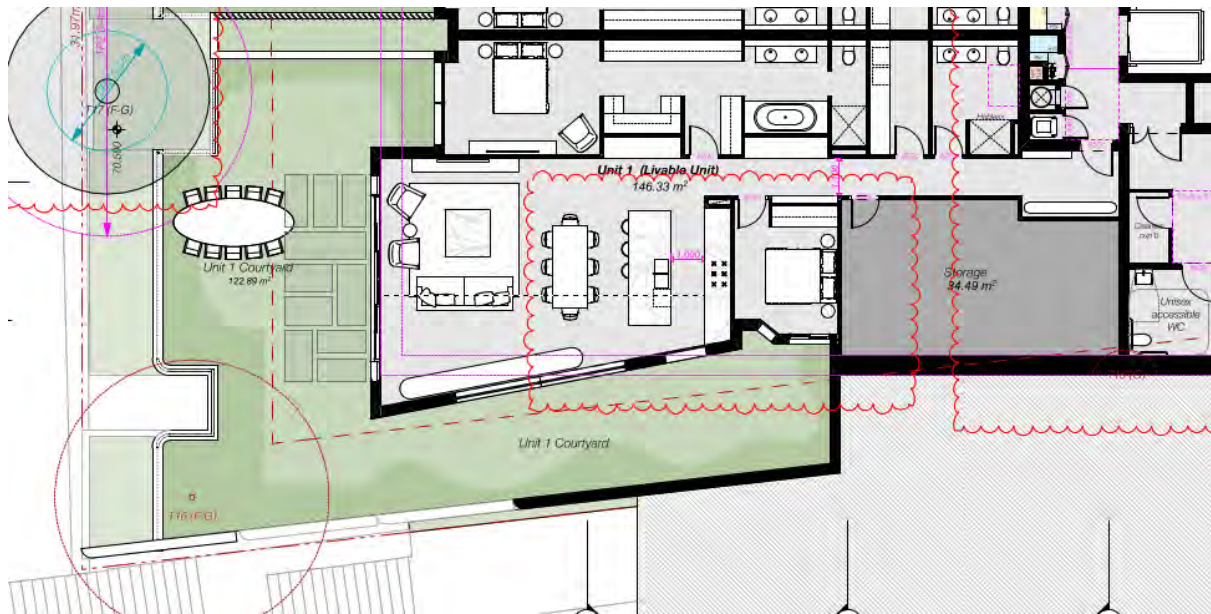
Originally proposed Unit 1 plan – subject to Condition AA1
